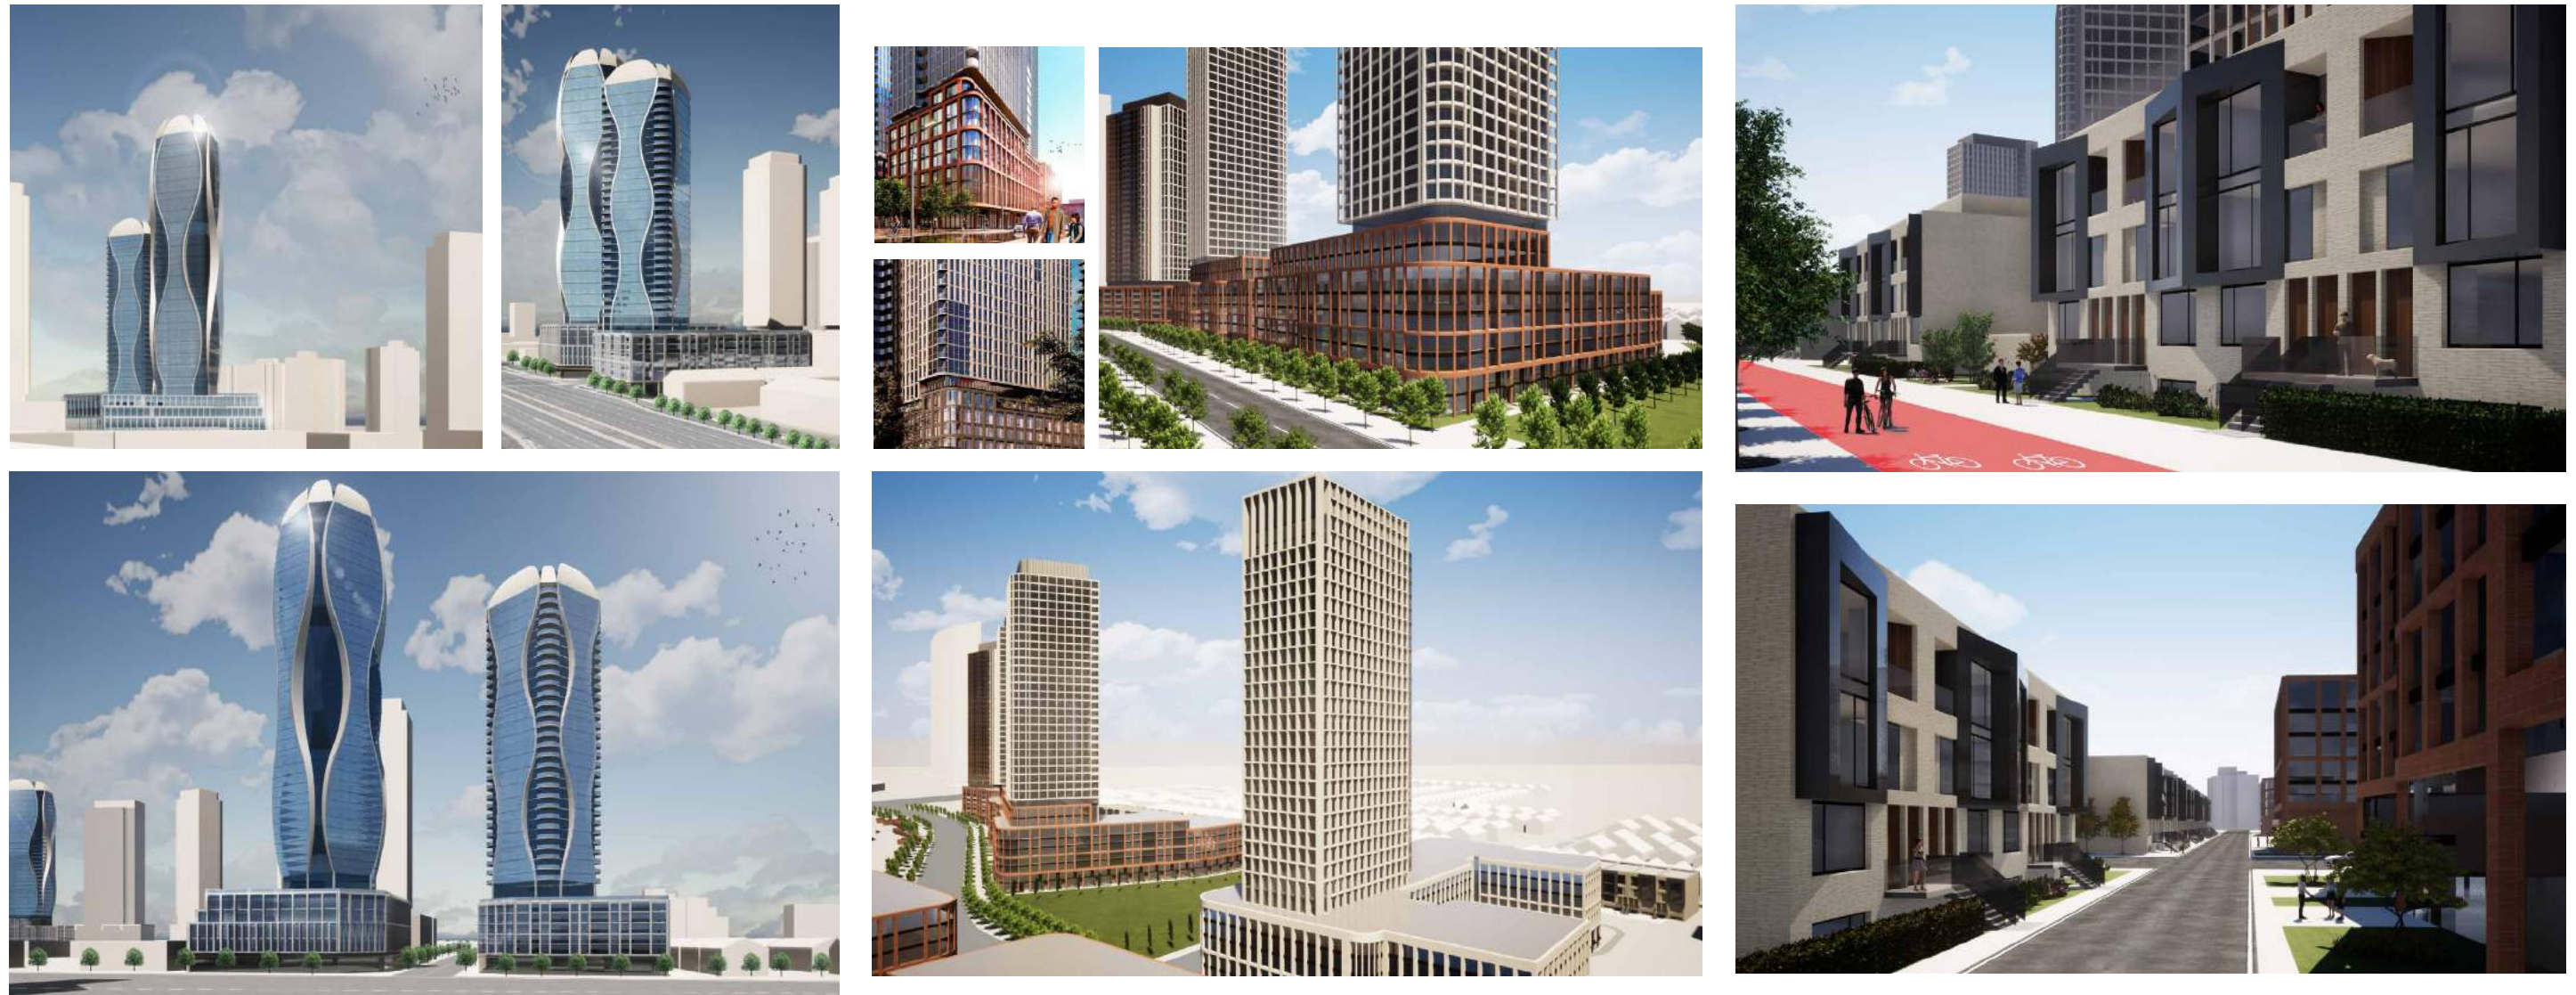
Built Form Types: Landmark Towers, Community Towers and Townhouse Blocks (Prepared by: BDP Quadrangle)
